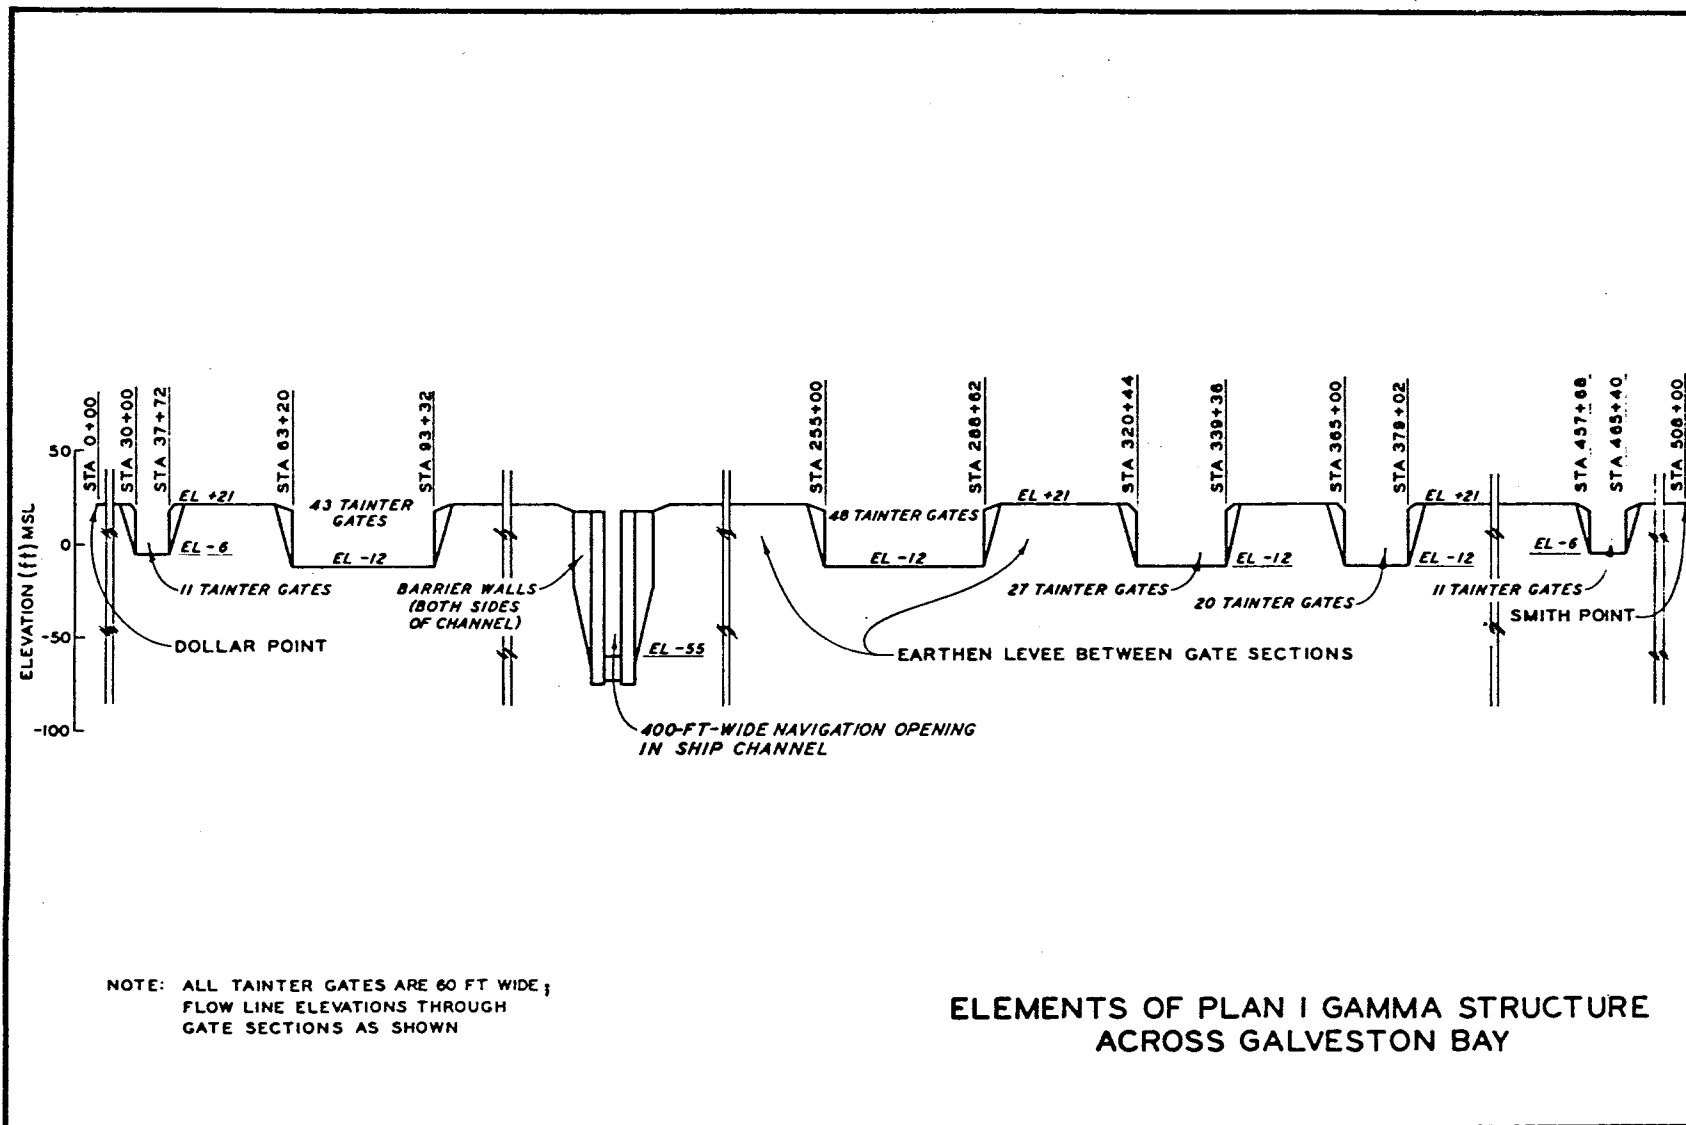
Proposed Gamma plan structure, Galveston Bay (Bobb and Boland, 1970a).
